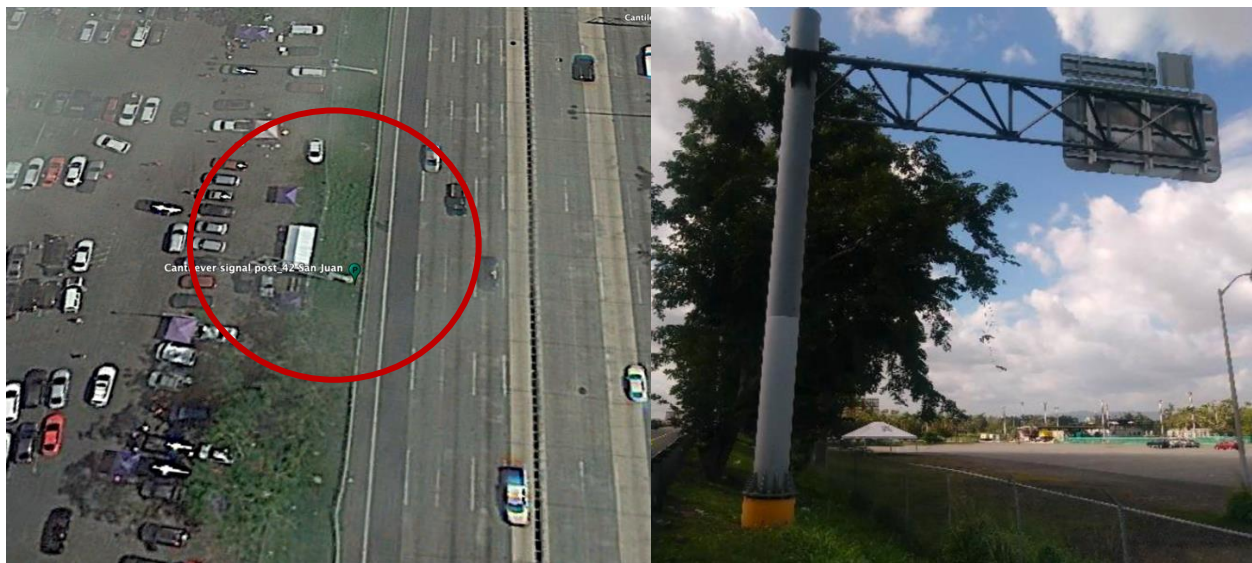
Photo of Cantilever Sign Foundation Failure (Torsional Rotation) at P- 42 Photo Location: 18°24'54.71"N; 66° 4'13.43"W
